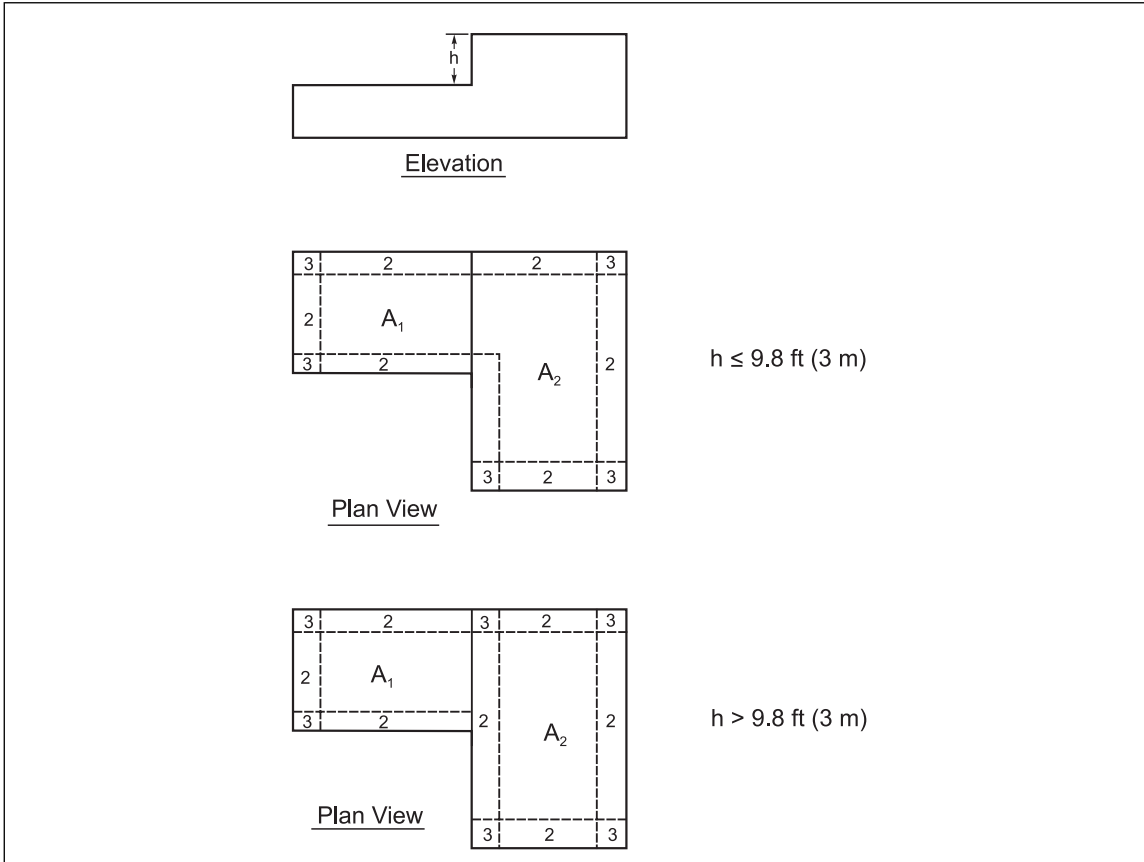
Roof zone designations for a roof with a height differential
